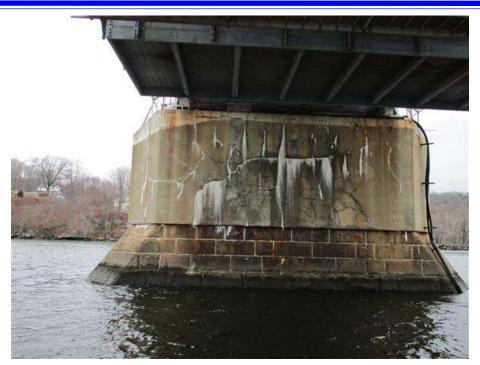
Photo Taken: 12/18/2015 West elevation of pier 2. Note map cracking with efflorescence to concrete cap.
